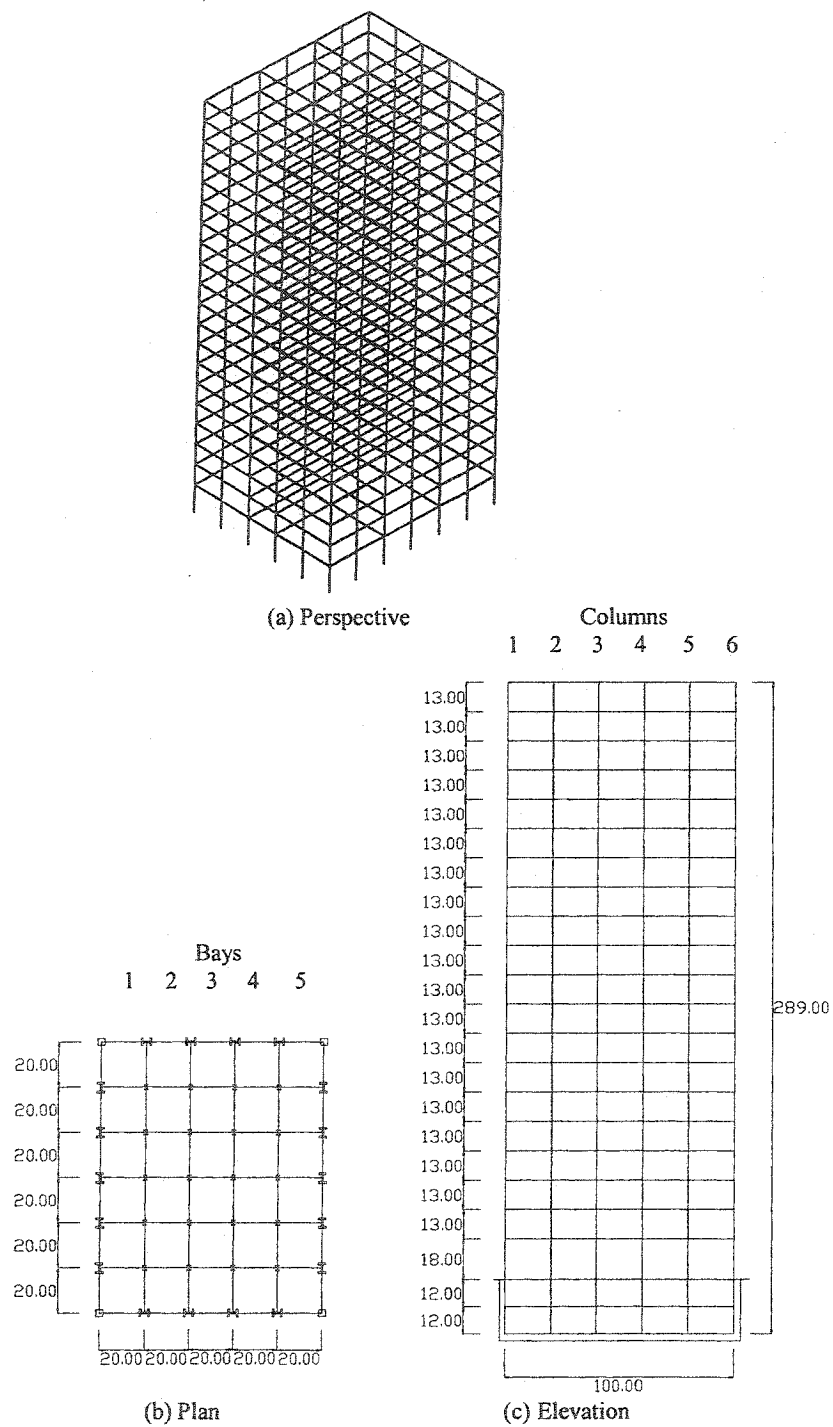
20- Story Building Perspective, Plan and Elevation
